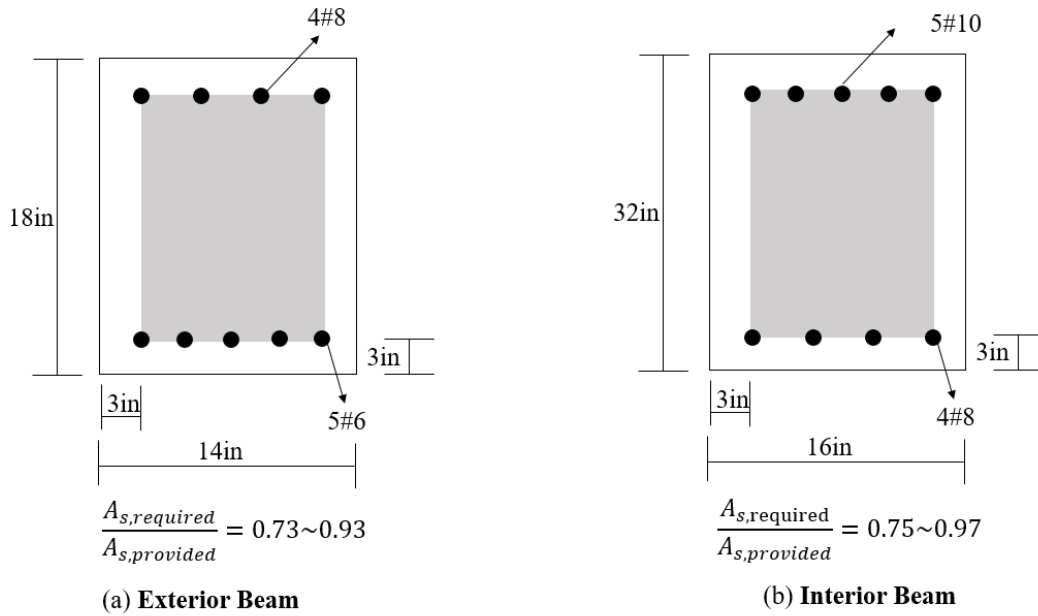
Reinforcement and geometric details of the exterior beams and interior beams
